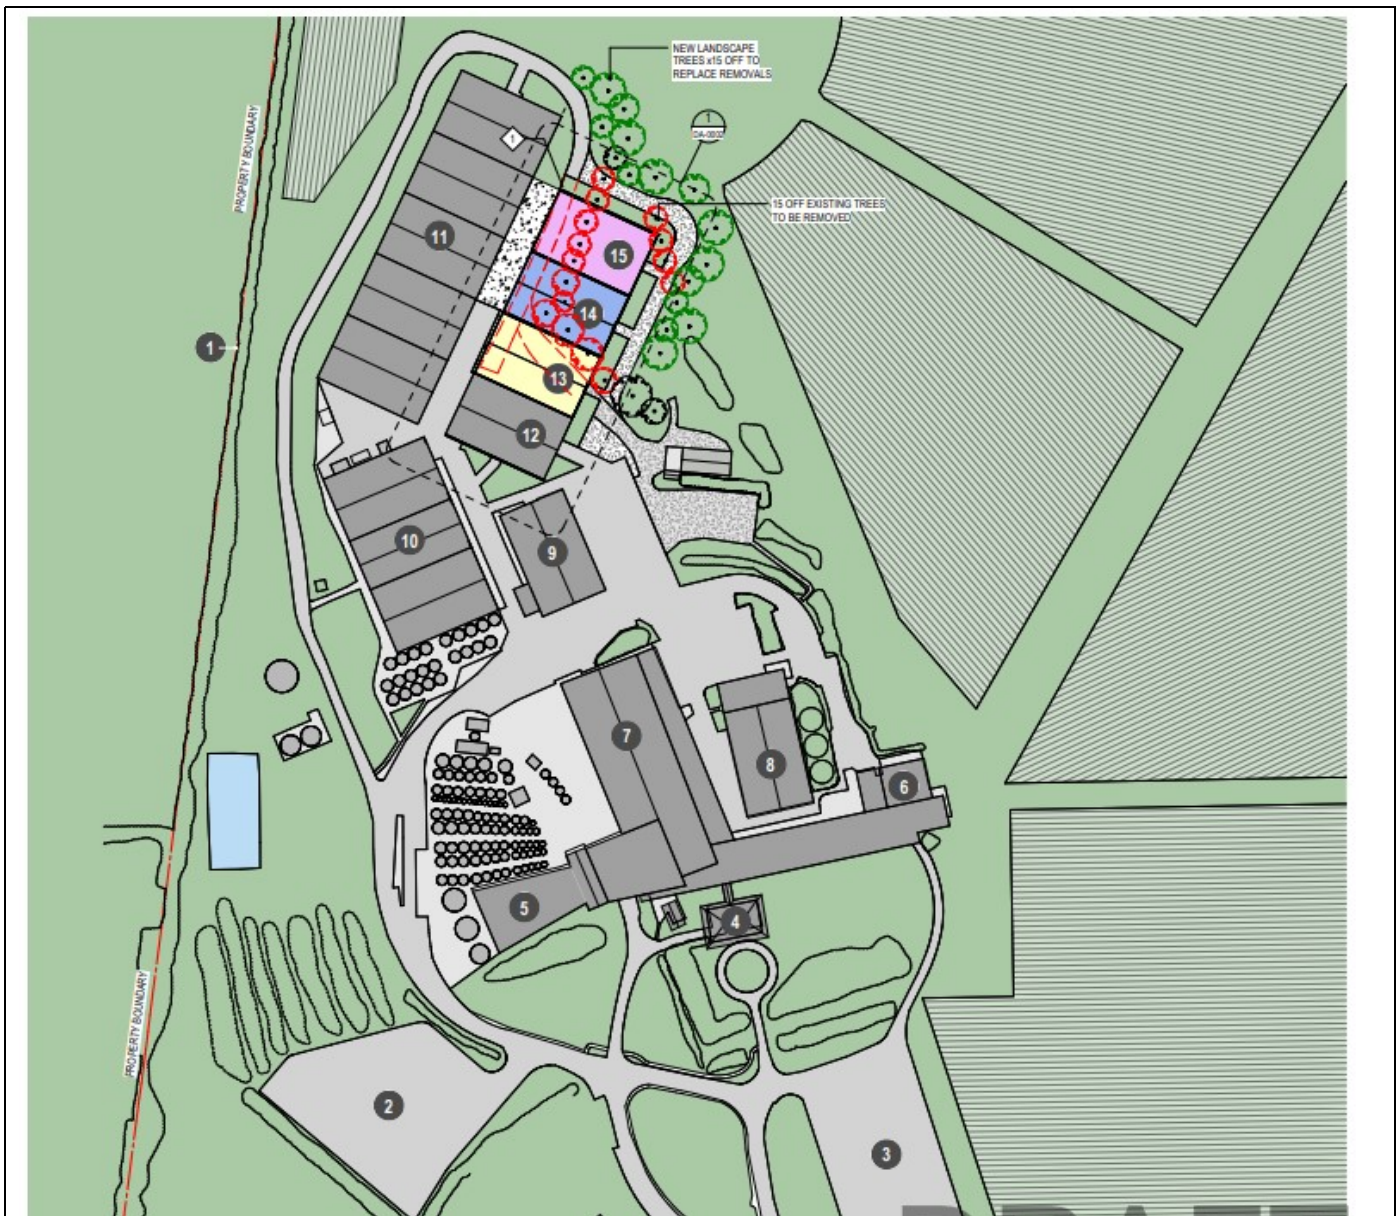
Proposed warehouses shown as coloured buildings 13-15
